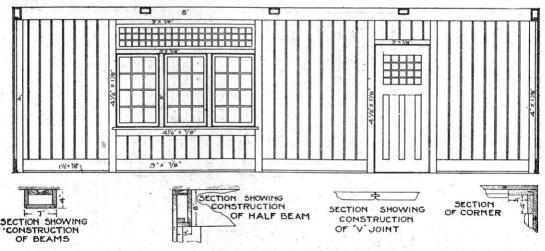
AN ELEVATION OF THE INSIDE WALL OF A CRAFTSMAN ROOM SHOWING ANOTHER TYPICAL FORM OF CONSTRUCTION—V-JOINTED BOARDS: THE SECTIONAL DETAILS BELOW ARE ENLARGED.
